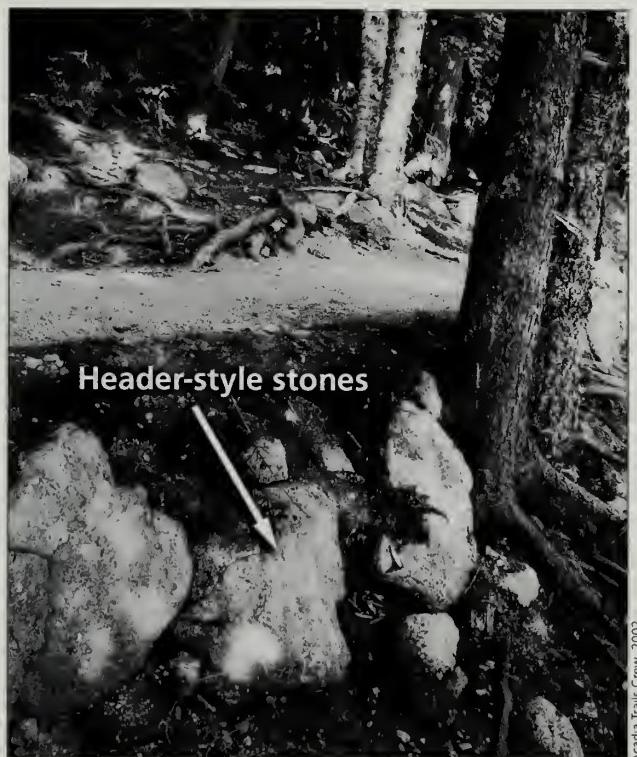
New crush wall constructed by NPS in 2002 through heavily rooted area on the west side of the Jordan Pond Path (#39).
